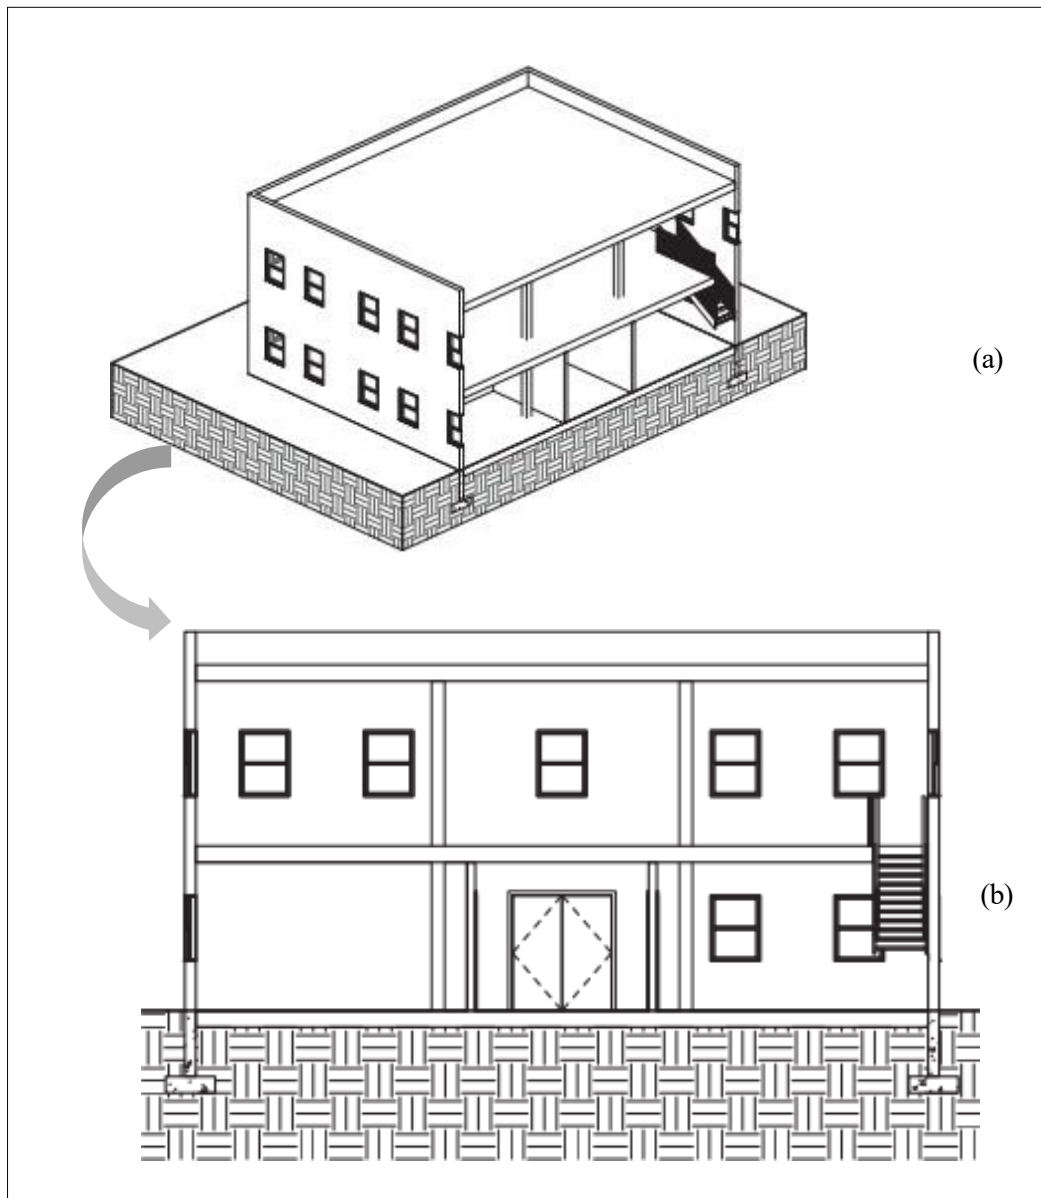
Example of section plan, (a) 3D view, (b) Section⁴
